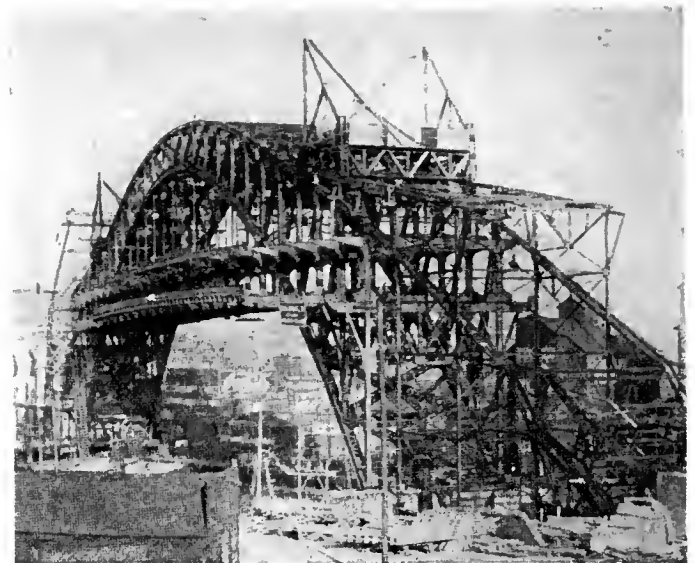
Archclosed and double-deck floor steel placed by returning Travellers.
